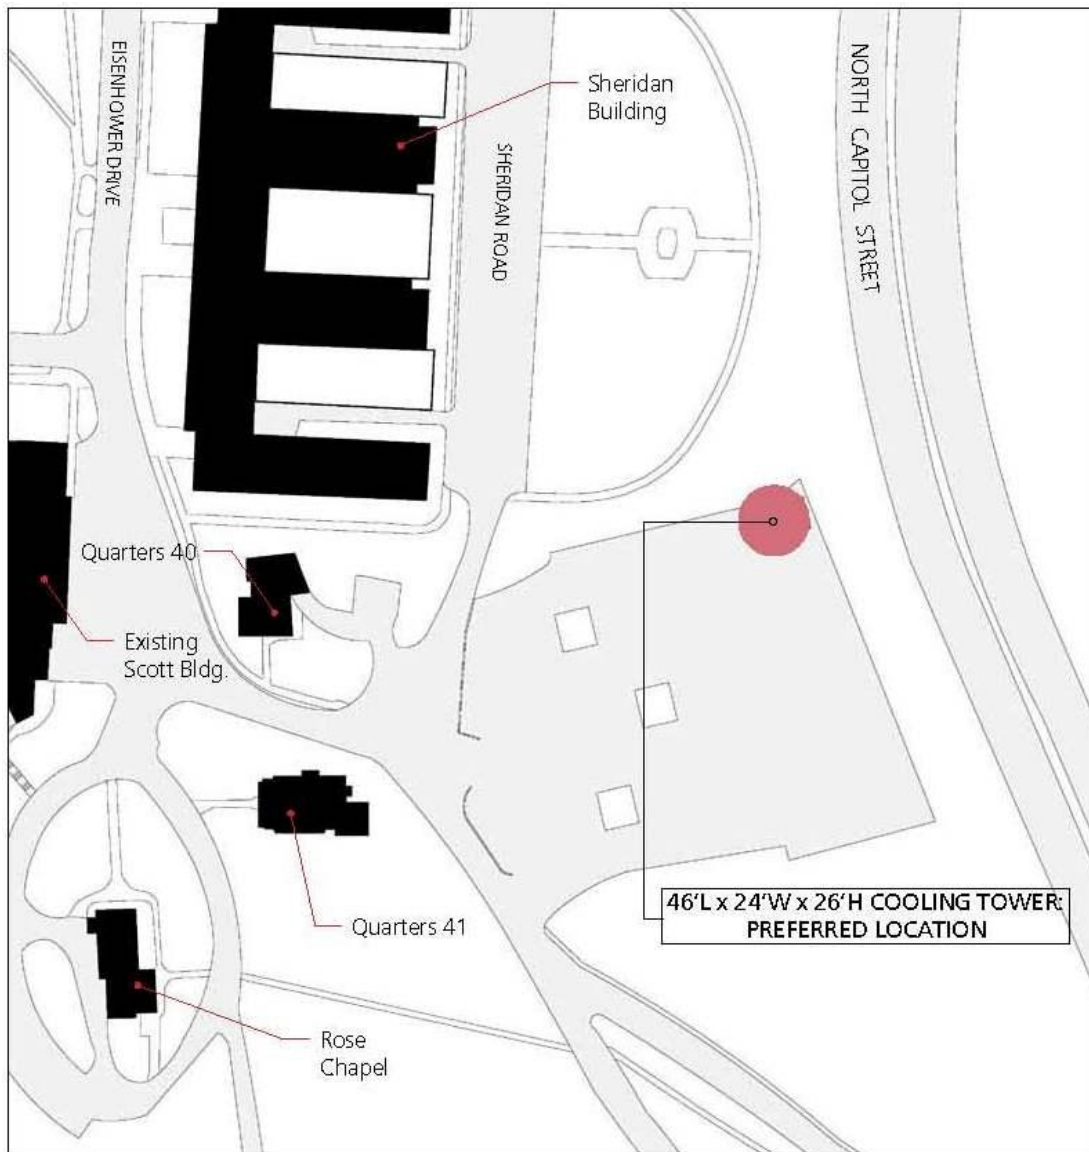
Preferred Cooling Tower Location (Adapted from DiMella Shaffer)
